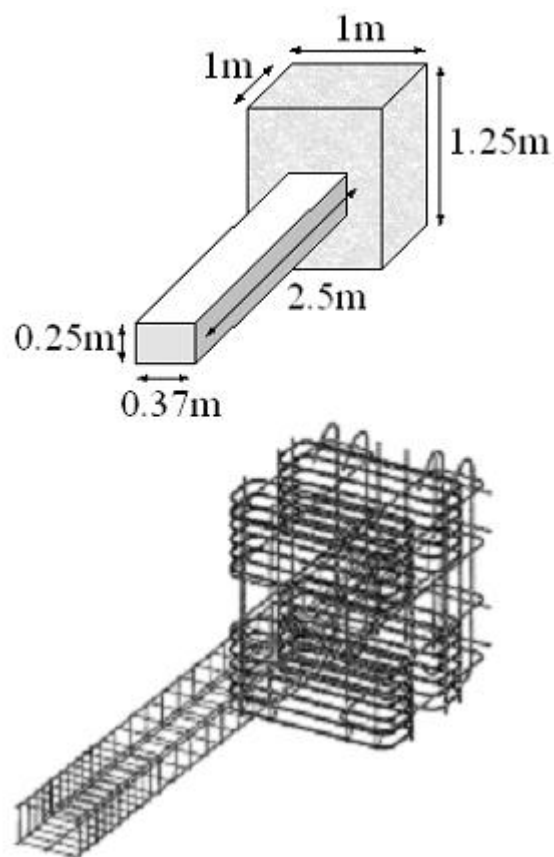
Dimension and reinforcing cage of the RC column (Sadone et al., 2012)
